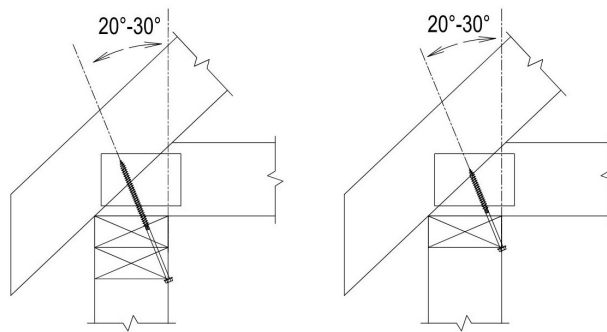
INSTALLATION OF FASTENERS AT AN ANGLE IN DOUBLE TOP PLATE TO TRUSS/RAFTER/JOIST APPLICATIONS
